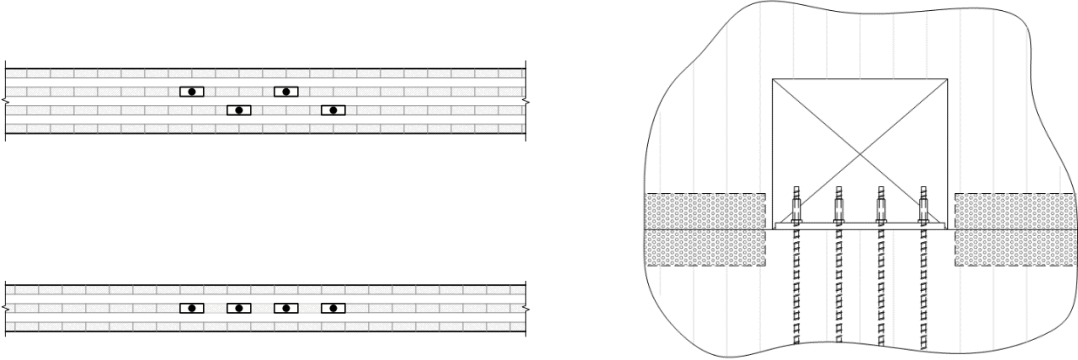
Post-tension rods in CLT wall (left) and rod connection and CLT splice (right)
